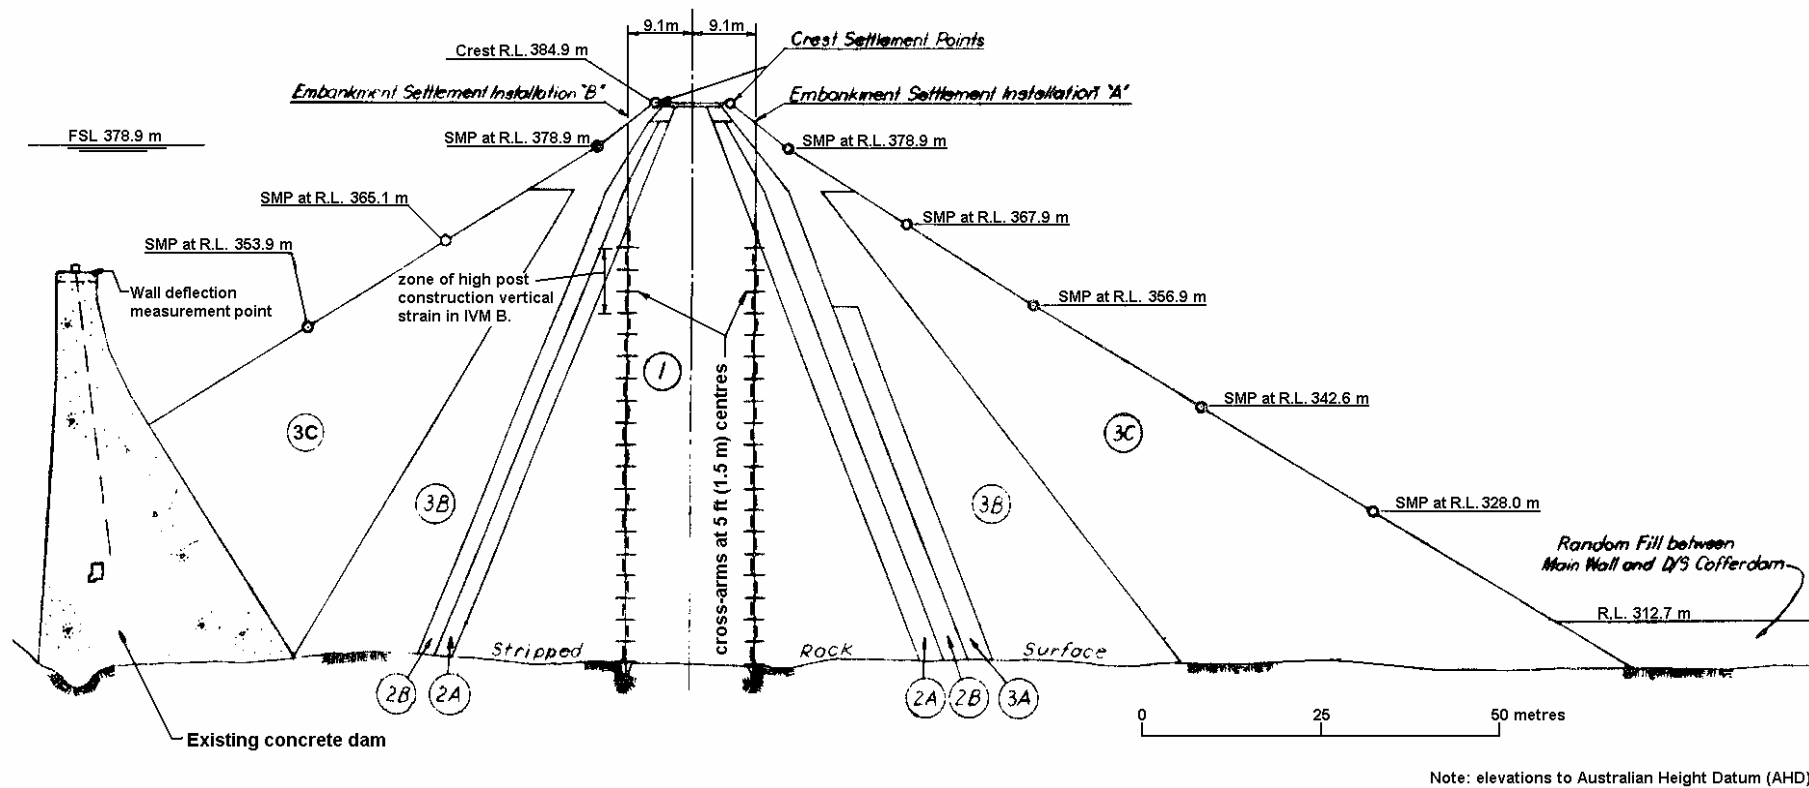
Section at Wyangala dam (courtesy of New South Wales Department of Land and Water Conservation).
